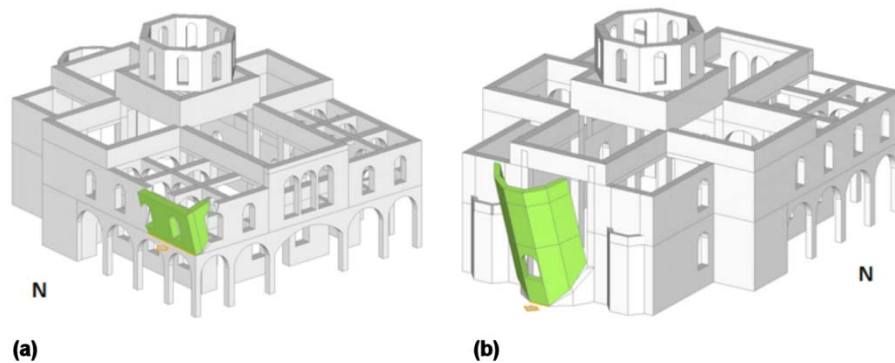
Selection of different local collapse mechanisms: (a) overturning of a structural part in the north façade; (b) overturning of the central apse in the east façade.
